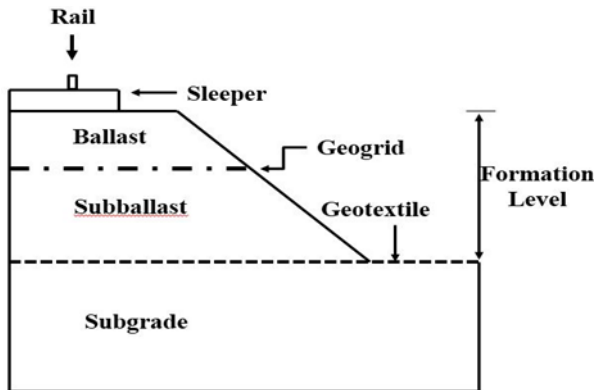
Cross-section of a typical geosynthetic reinforced railway track
